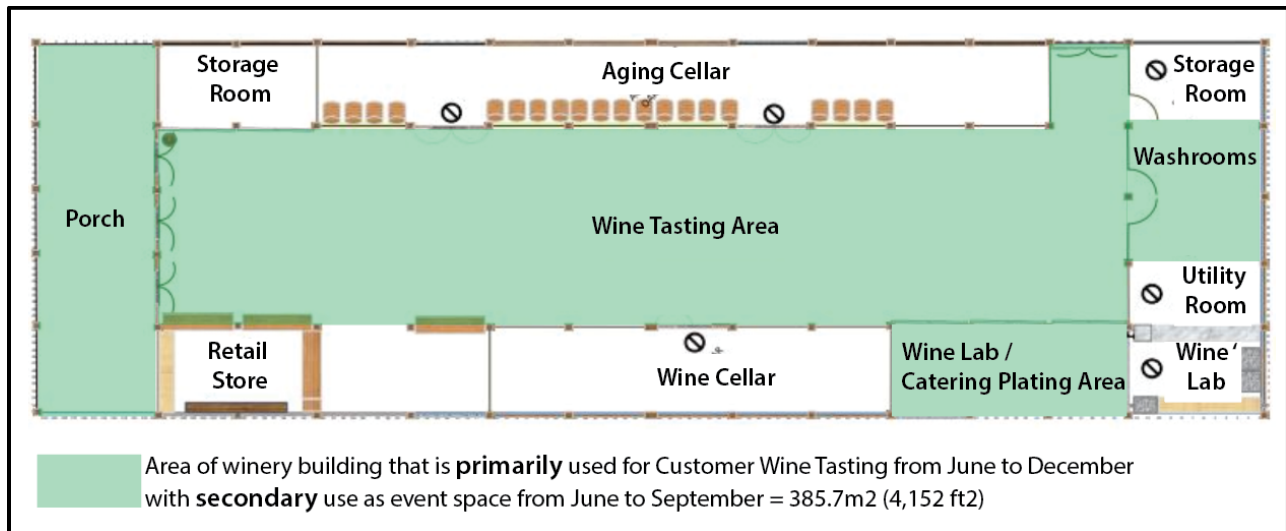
Floor Plan of Winery Building Showing Areas to be Used as a Place of Assembly
